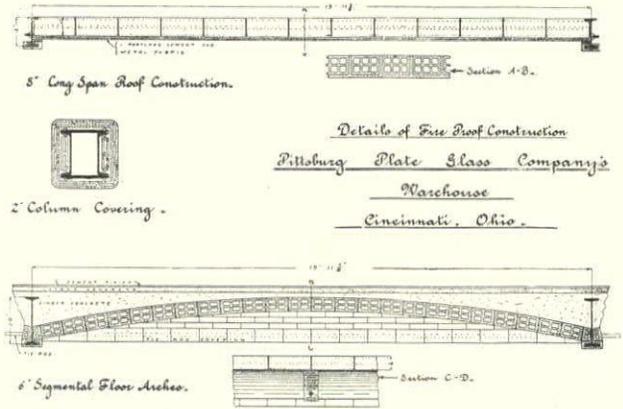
SECTION OF LONG-SPAN SEGMENTAL SIDE-PRESSURE ARCH; ALSO LONG-SPAN ROOF-CONSTRUCTION, WITH STEEL TENSION (JOHNSON SYSTEM).
